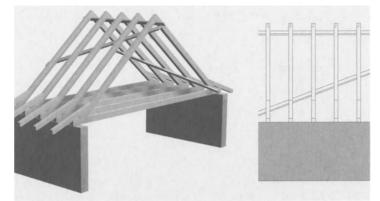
illustrates the structural system of the close-couple roof. A collar can be included for greater building widths. In the closecouple roof the loads are split at the ridge (Fig. b292), which means that the rafters have to withstand axial compression as well as bending. At the eaves, the forces are split into a horizontal and a vertical component. Besides the vertical loads, considerable horizontal forces also occur at this point. Buildings with close-couple roofs therefore require a topmost floor whose structural members can accommodate tensile forces, unless other measures are used to guarantee that the base of the rafter is held rigidly in position. This is the case with roof structures designed to achieve a plate effect (e.g. reinforced concrete slab), or specially designed external walls of reinforced concrete, for instance.
